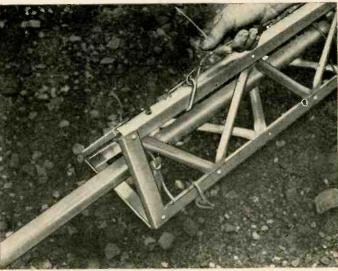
Triangular guy ring, eye and guy wire attached to top of tower. Thimbles and rings protect guy wire.
